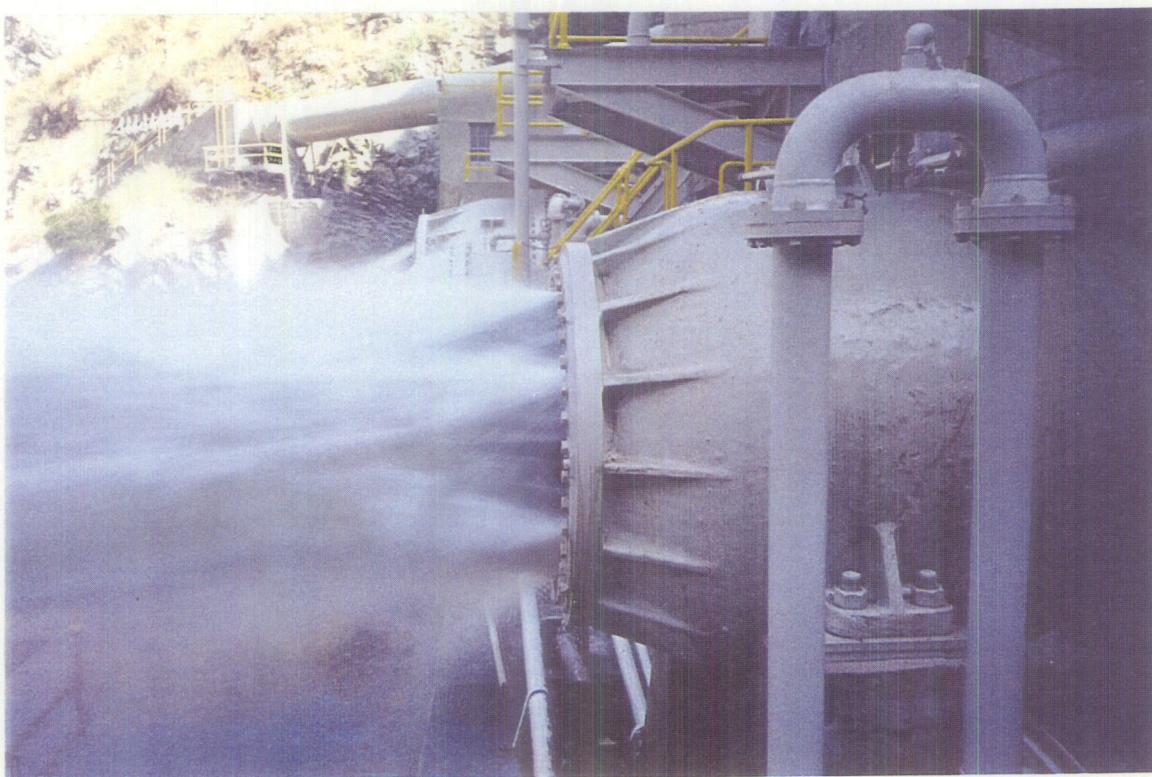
Morris Dam - Needle Valve 3 - View showing needle valve gooseneck piping, and discharge at full head.
